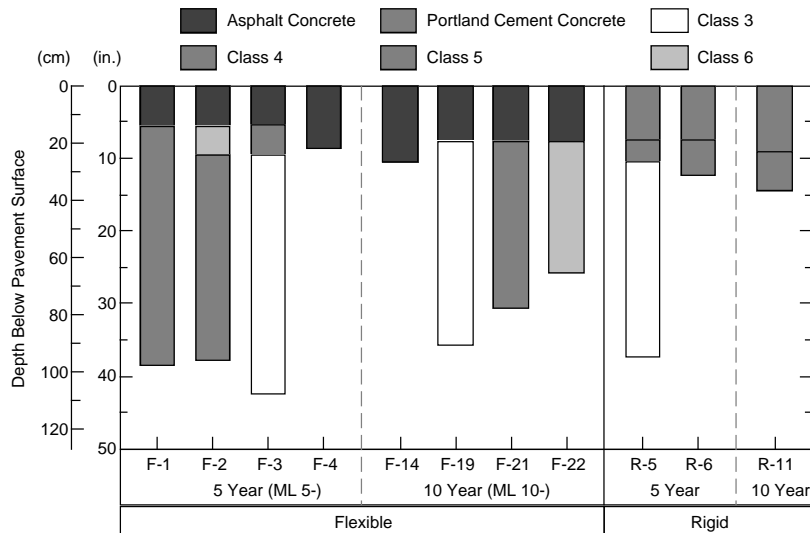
Pavement structure of Mn/ROAD test sections simulated.
